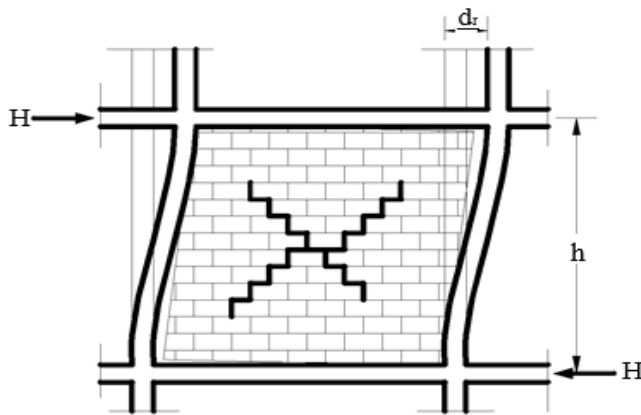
Masonry failure with X-shaped cracks due to the R/C frame inter-storey drift (Penils and Kappos, 1997)
